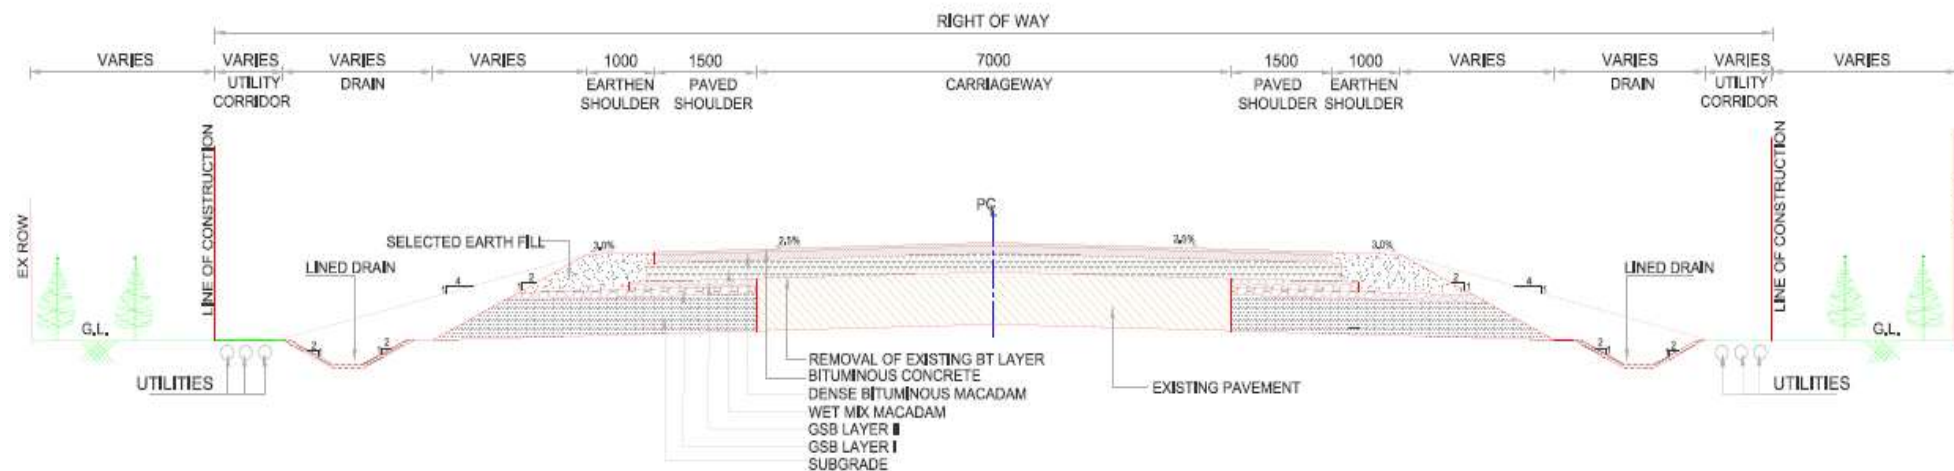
TCS-1 Two lane carriageway with paved shoulder in rural areas
